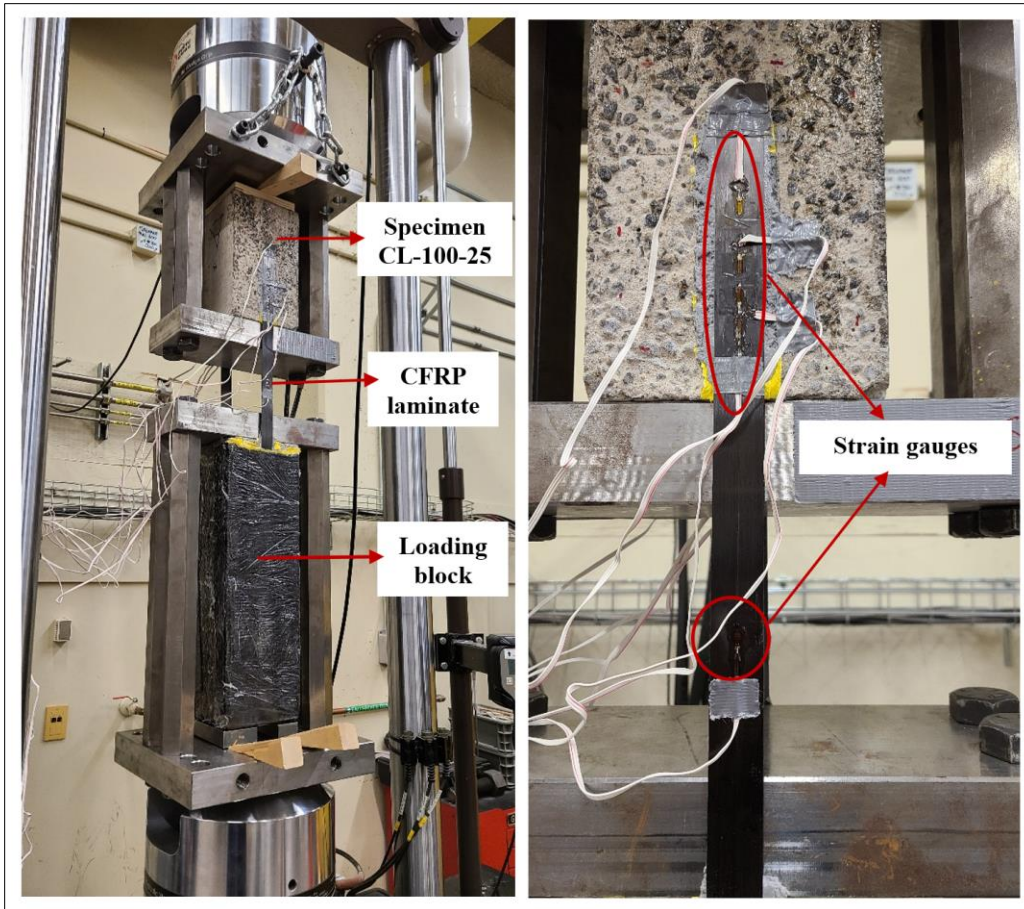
Cyclic testing configuration (Specimen CL-100-25)
